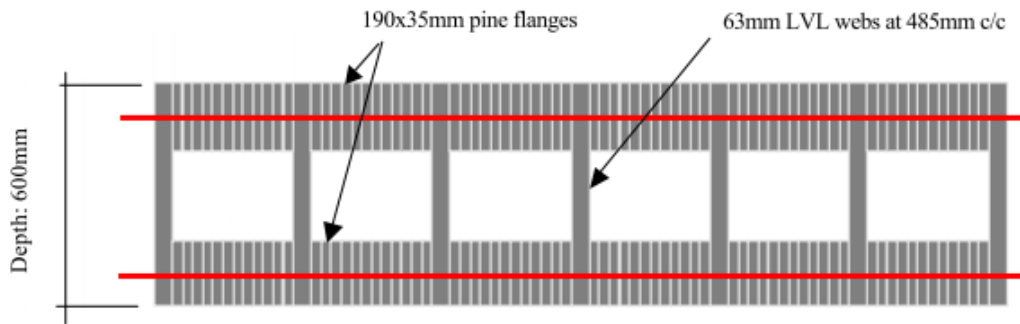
Cross sectional Detail of an example transversely post-tensioned timber deck. (Crews, 2002)
